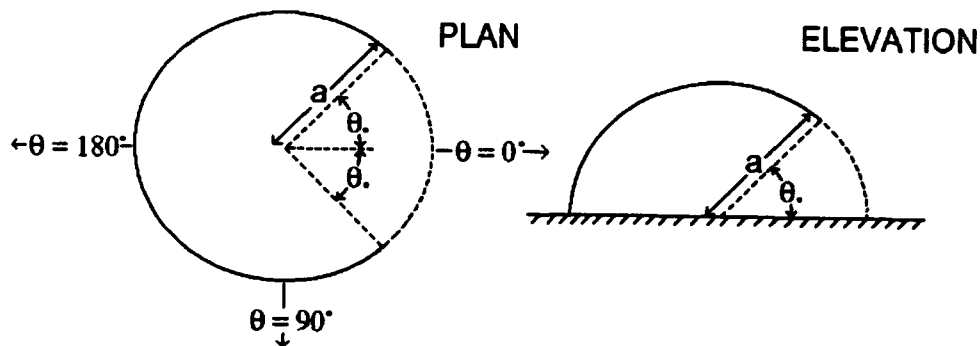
Plan and Elevation Diagrams of a Spherical Acoustic Shelter.
